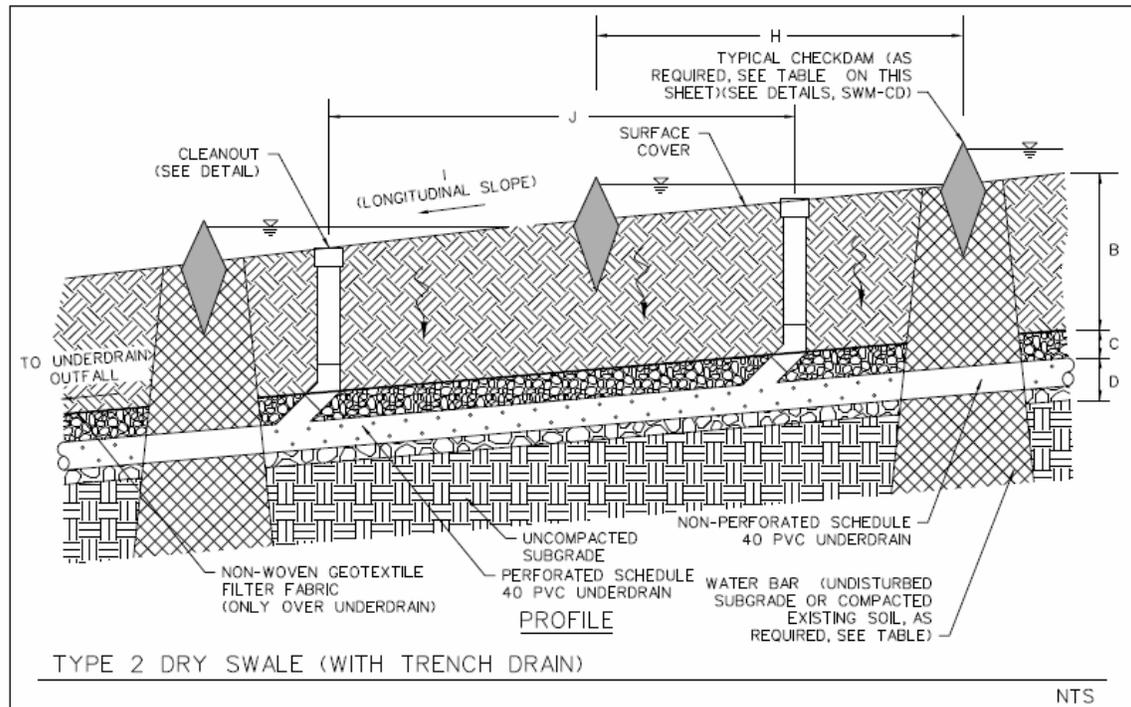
Typical Dry Swale – Level 1 [Profile View]
